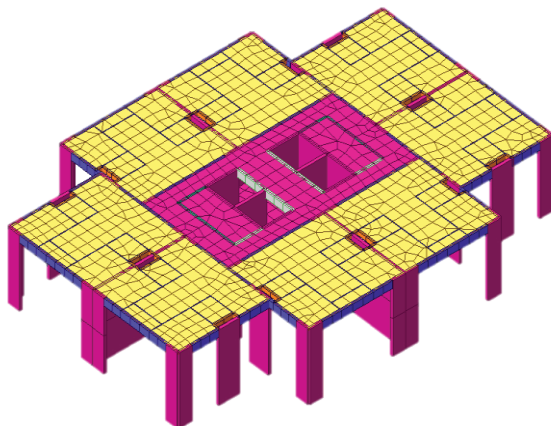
Structural Arrangement of Typical Floor (Post Tensioned Concrete Floor)
